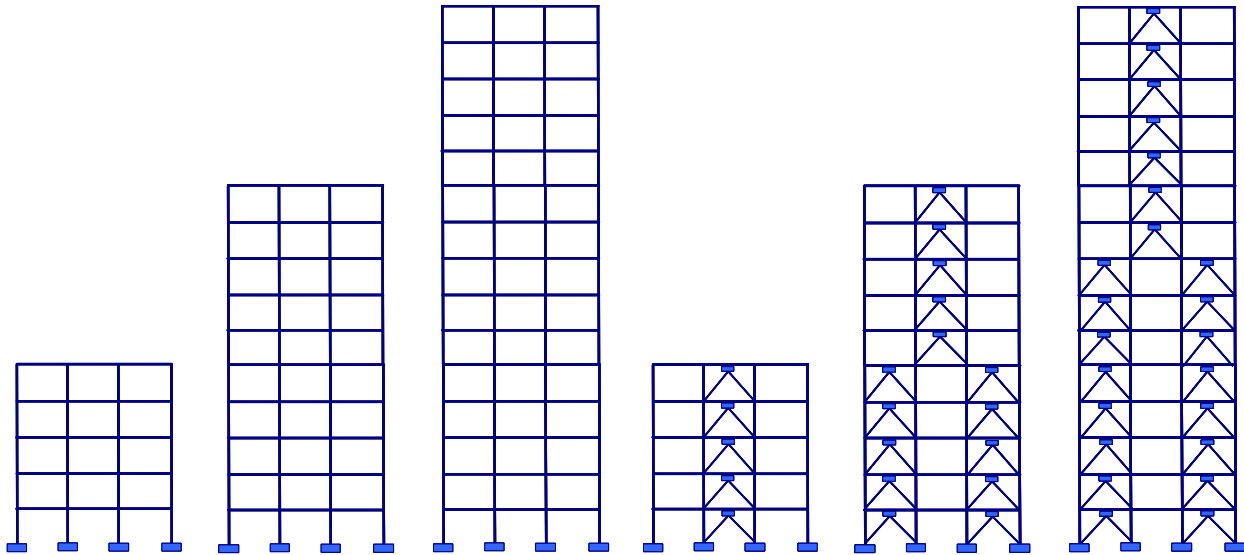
The elevation of 5 story, 10 story and 15 story case studies buildings (Bare frames & retrofitted frames by dampers).
